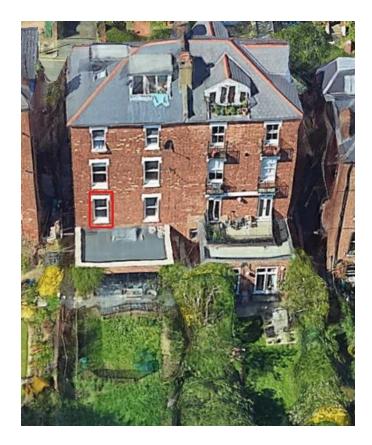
The rear elevation of the existing building with the window that has been replaced outlined in red.
